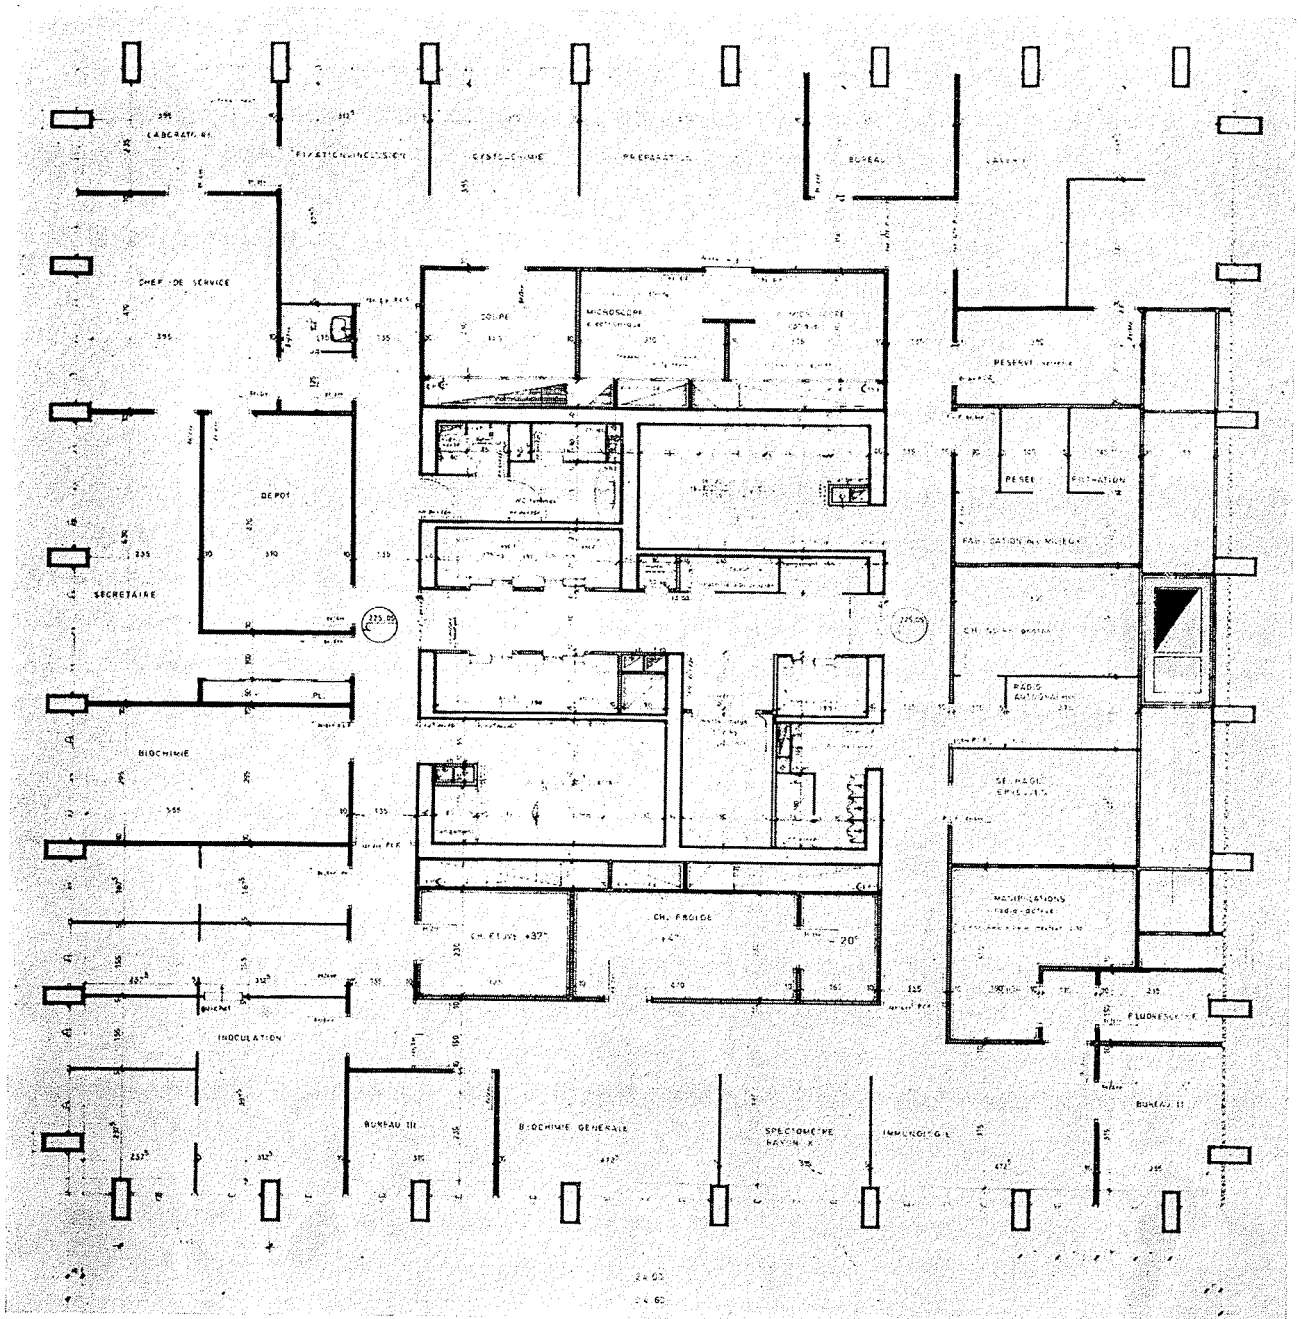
Typical floor plan of proposed new building. The walls can be removed to meet any modifications required.
